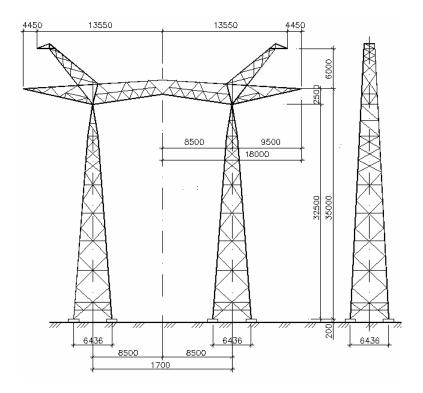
Typical 750 kV suspension tower ΠC750-3
